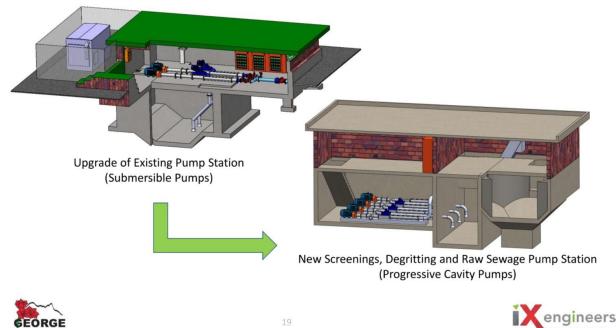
Design details of the proposed new pump station and the upgrading of existing pump station.
